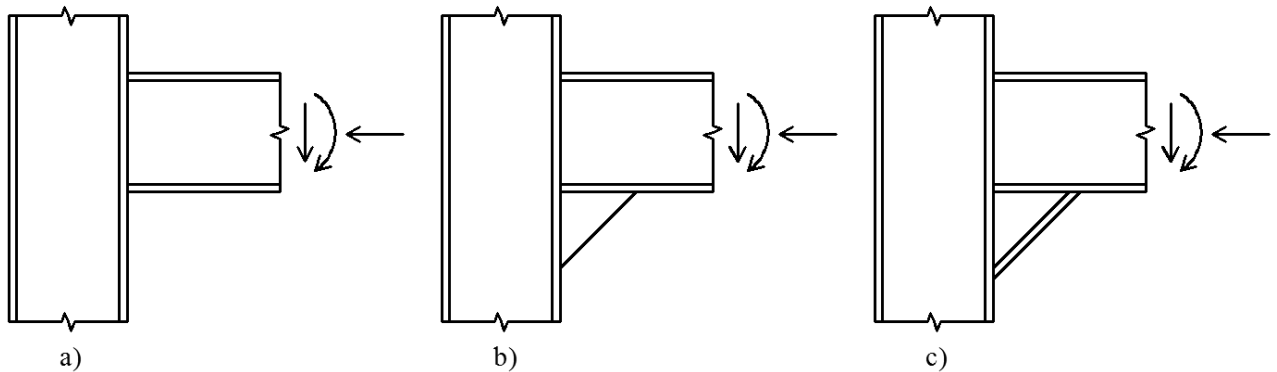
a) Beam-to-column joint without stiffener; b) Beam-to-column joint with gusset (free edge); c) Beam-to-column joint with haunch (partially stiffened or clamped edge)
